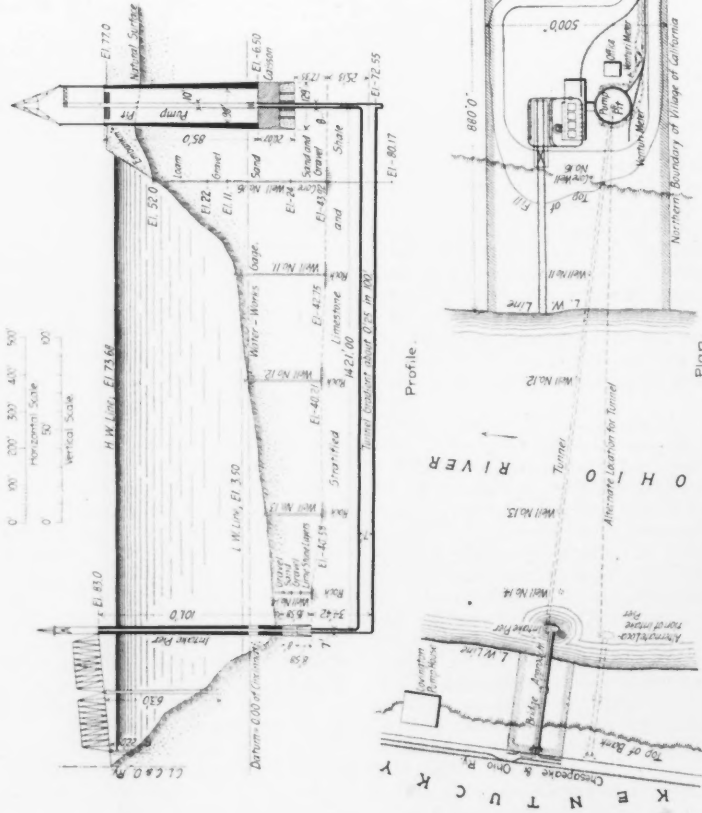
PLAN AND PROFILE OF INTAKE PIER, TUNNEL AND PUMP PIT.
